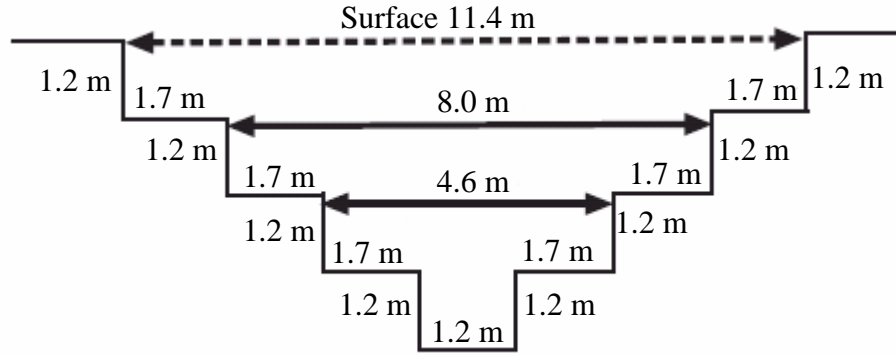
Schematic drawing showing a transverse cross section through a typical trench in the GHN rock pile. Horizontal dimensions are inside the section and vertical dimensions are outside.
